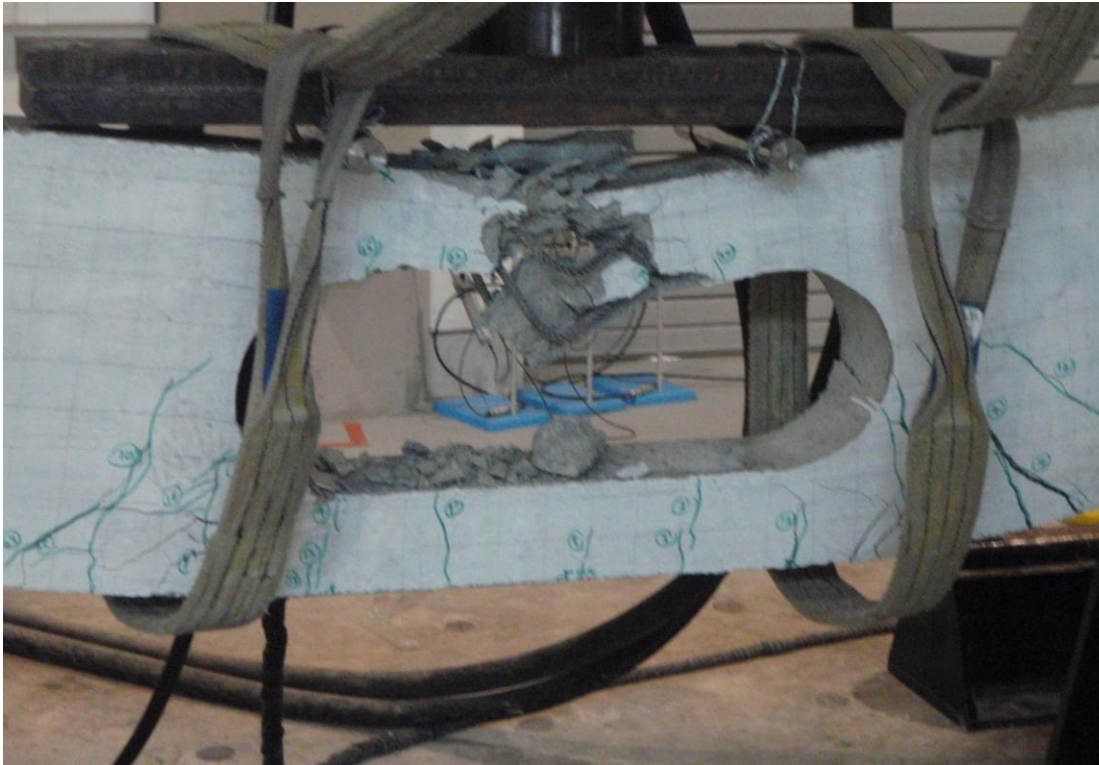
Failure of Beam with Elliptical Opening with Additional Reinforcement Bars along the Edges subjected to Static Load
